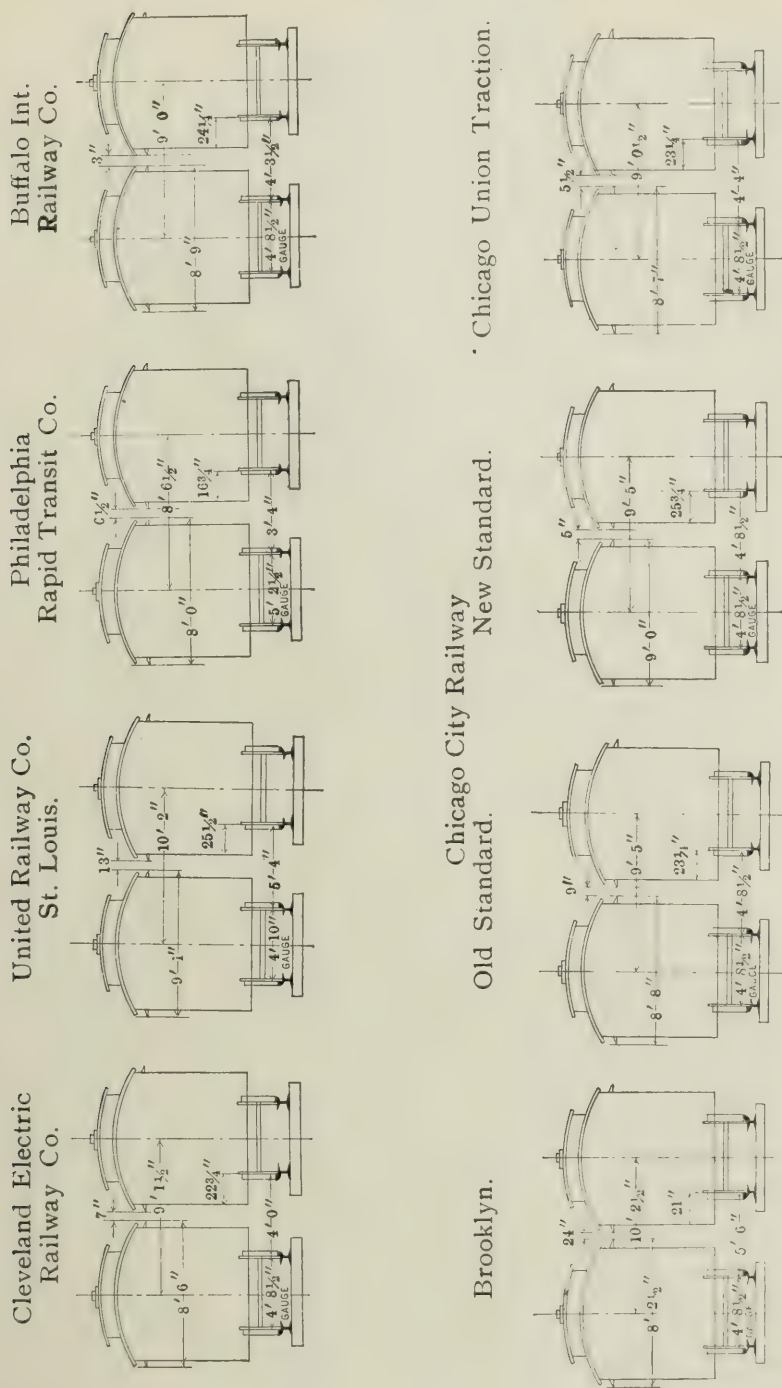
CONVENTIONAL DRAWINGS, DIMENSIONS OF CARS, AND CLEARANCES ON DIFFERENT ROADS
